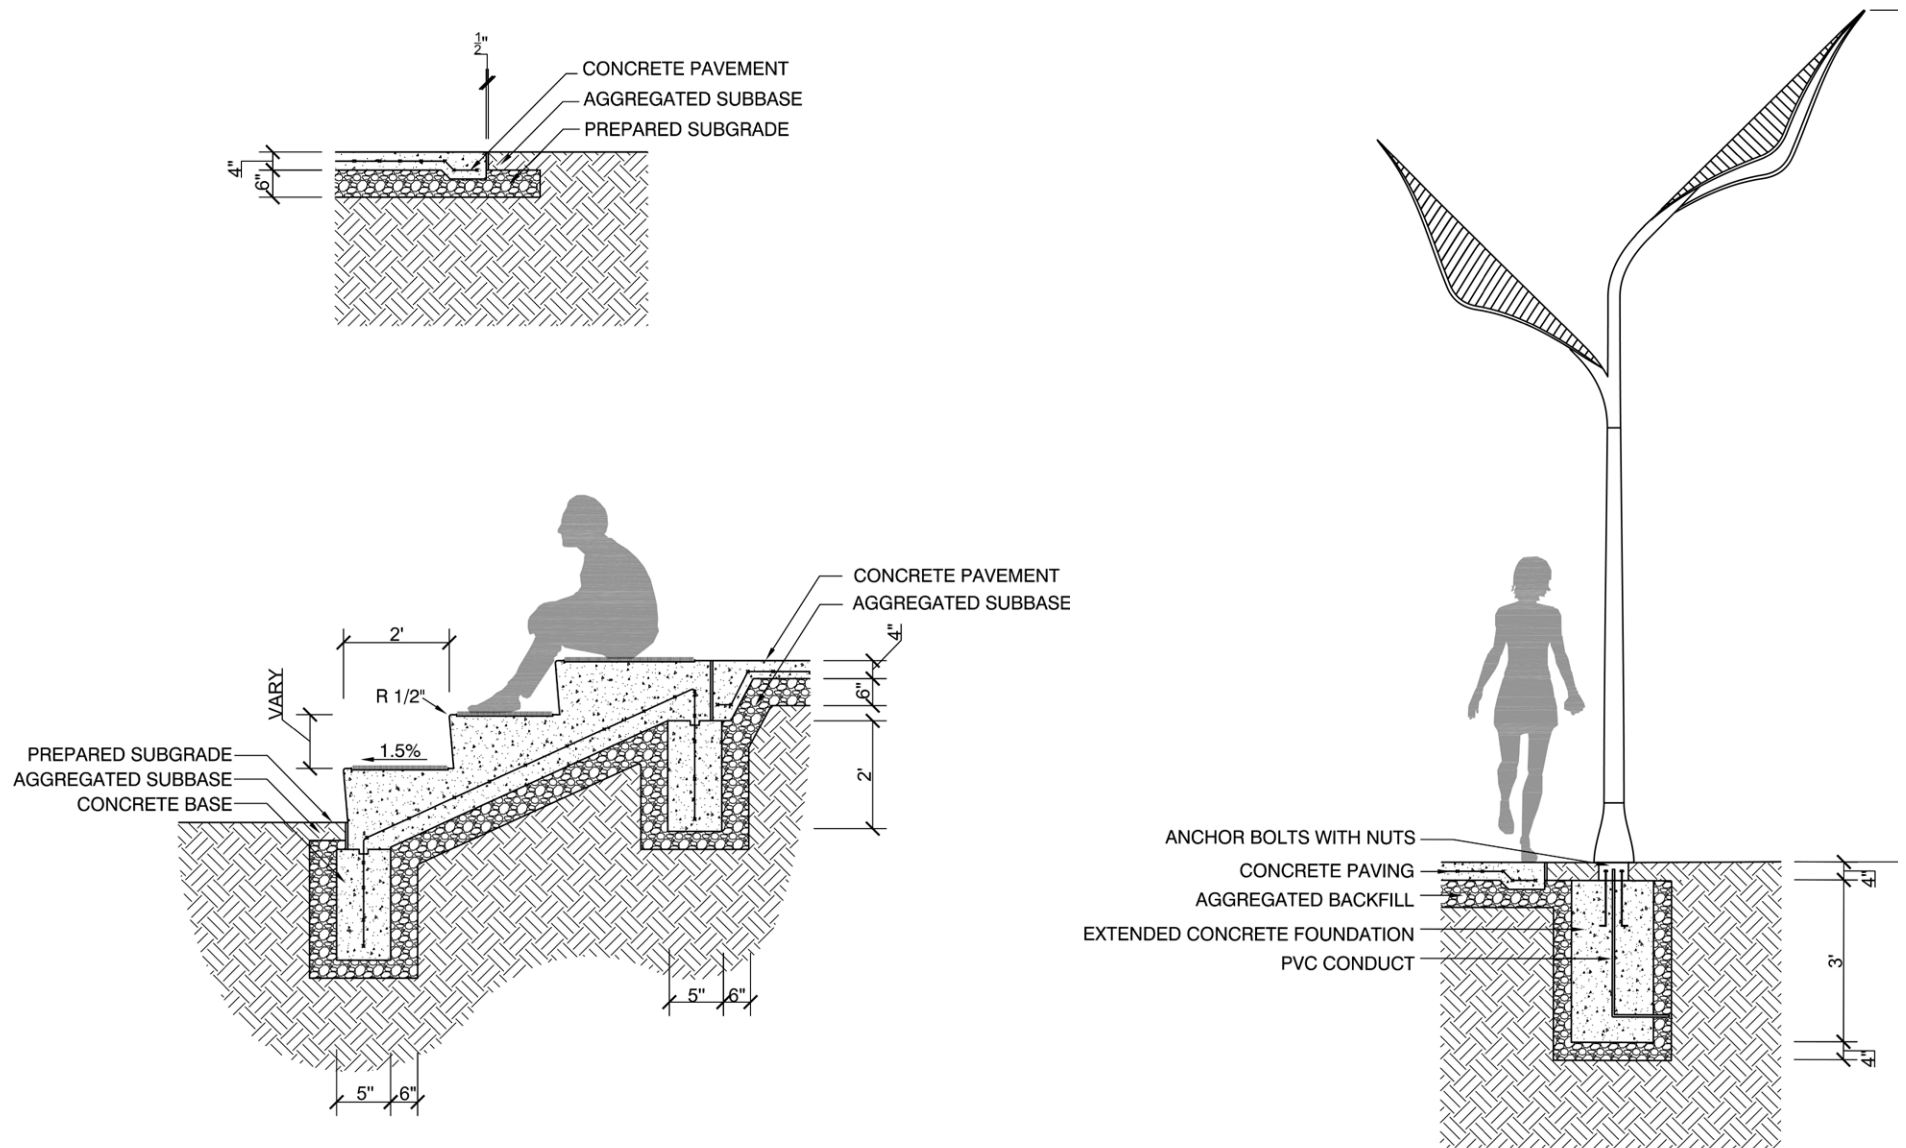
Typical Paving, Stairs and Light Pole Details
